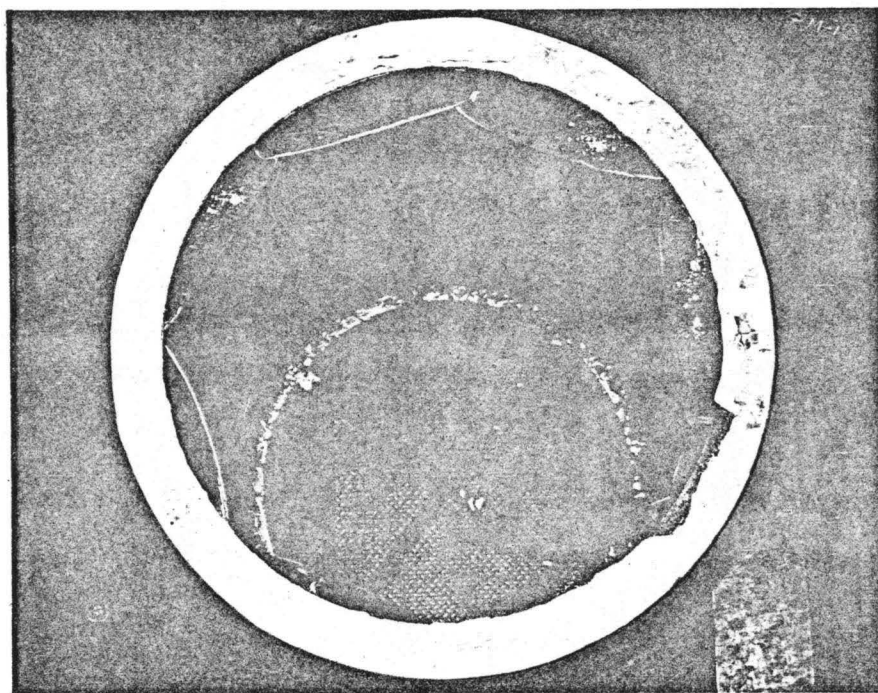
End View of Specimen P9 Showing Cracks along the Interior Fold of the Buckles
